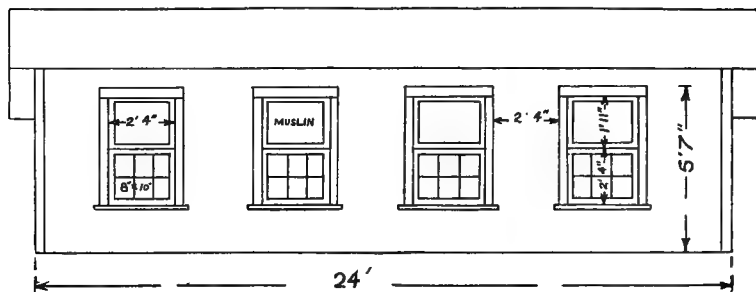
Front elevation of farmer's large colony house (Fig. 207)
